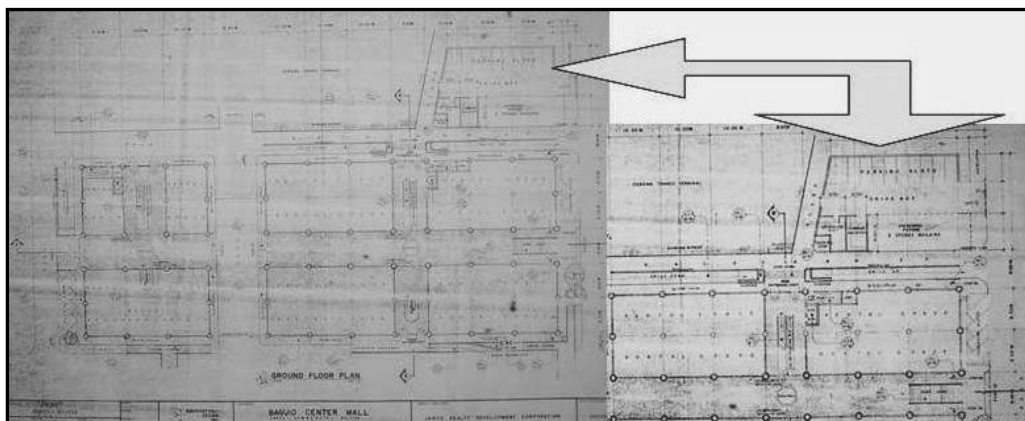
Ground Floor plan of Baguio Center Mall (BCM) with detail of plan for ground level development.
